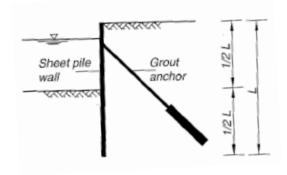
Principle of a anchored sheet pile wall with grout anchor
